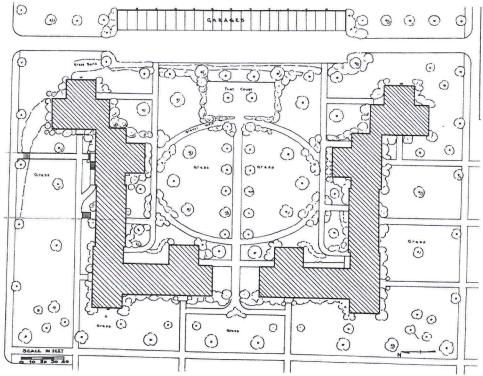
Small project site plan example. *Unit Plans*, Site Plan Section.
